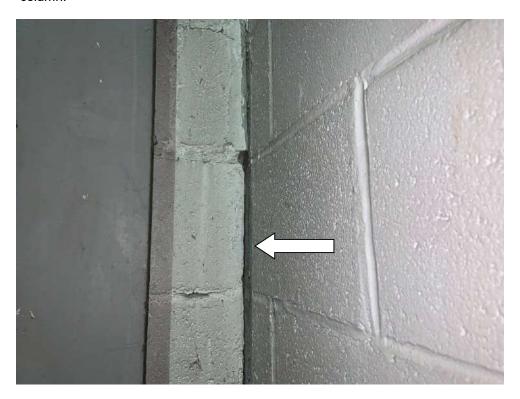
Post abatement view of the wall joint along the east wall at the Site.
